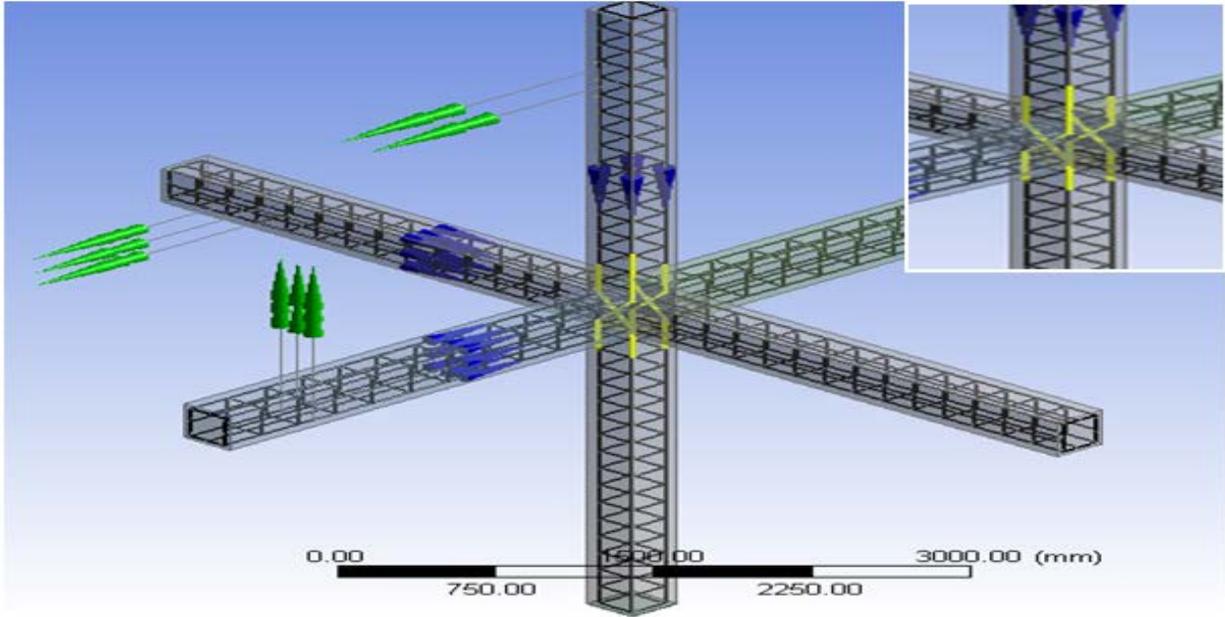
Modified reinforcement detailing of interior joint with four beams (SS4)
